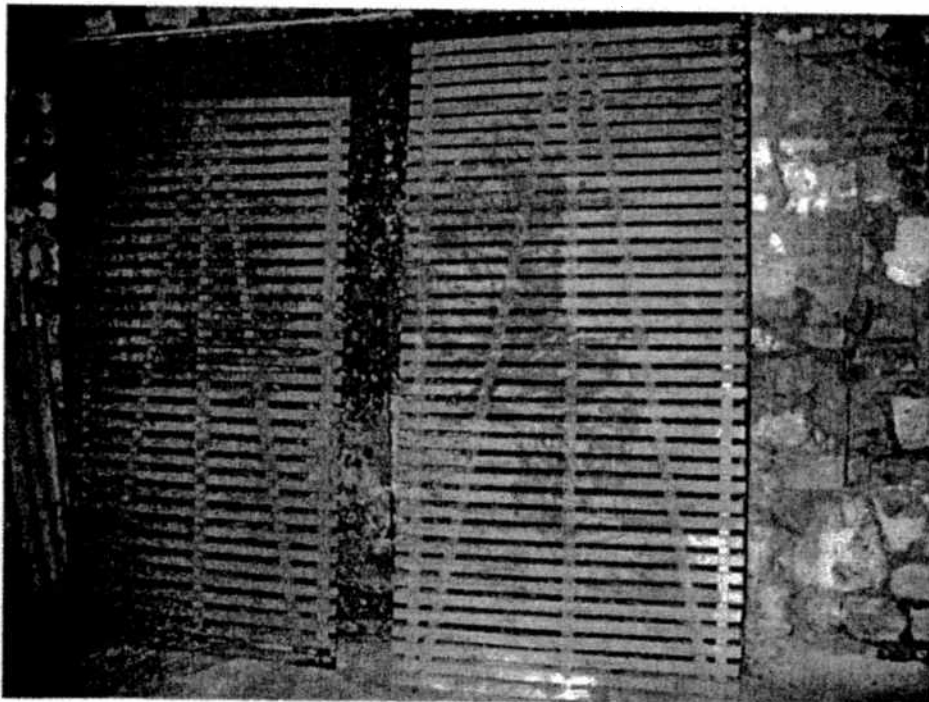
Wood lattice and Steel backstop at the south wall of the IFR where the sand trap was formerly located.
